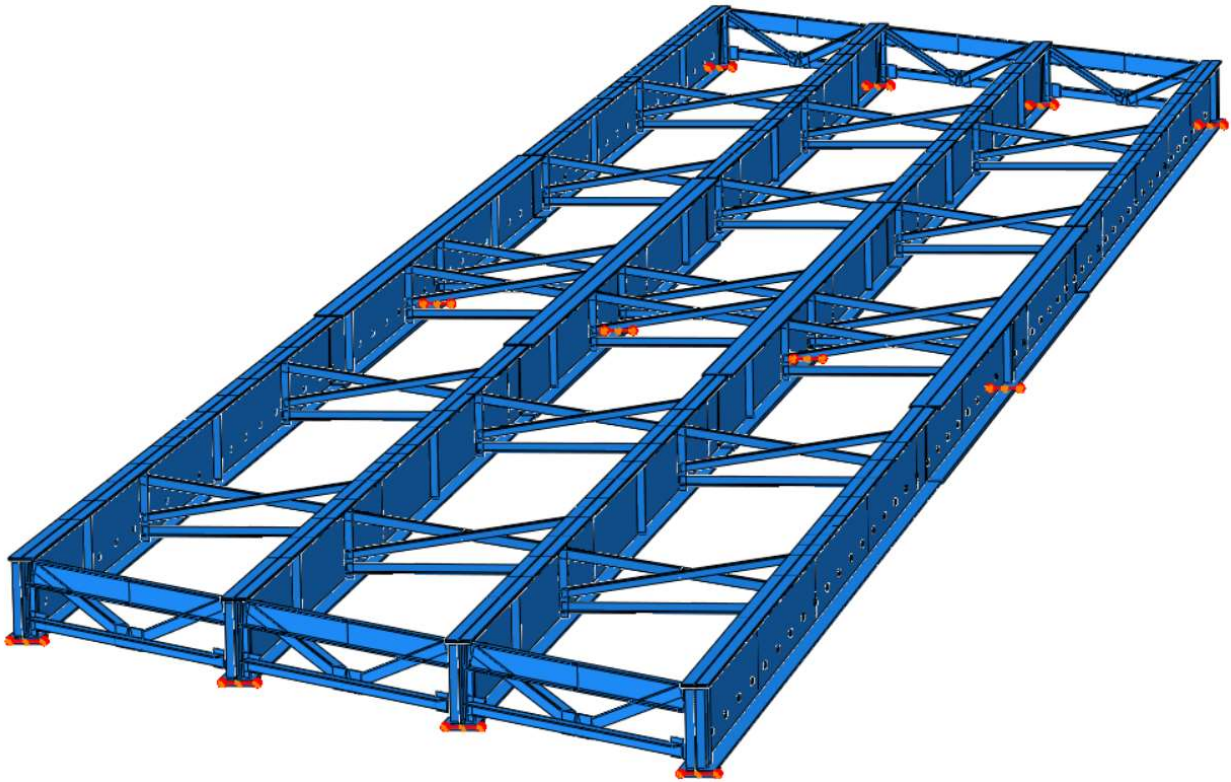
3D FEM model geometry of skewed-staggered bridge configuration (9.14 m [30 ft] cross-frame spacing)
